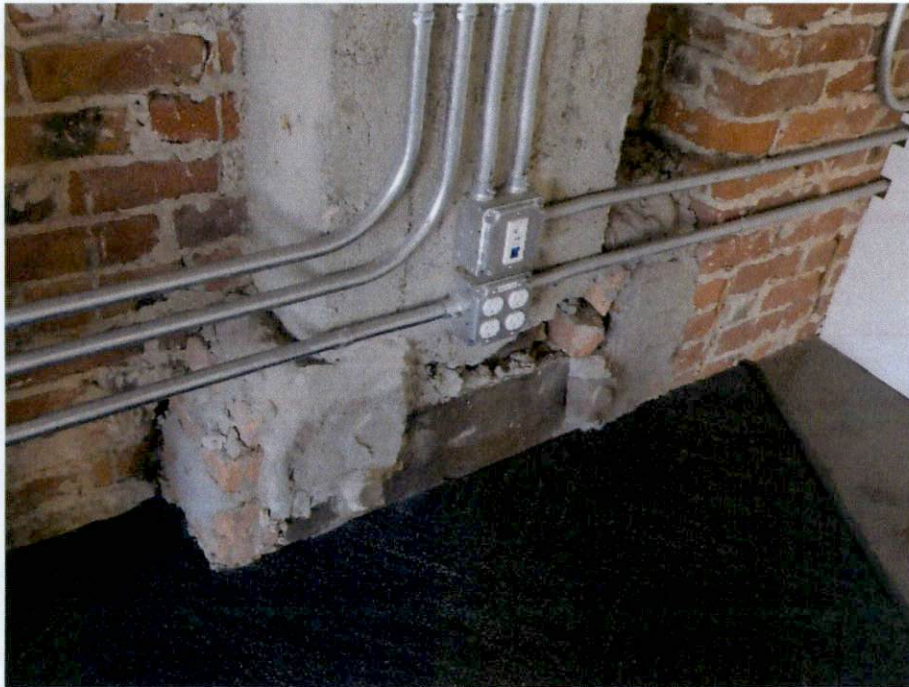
Exposed metal and damaged concrete coverage at column base -Third Floor.
